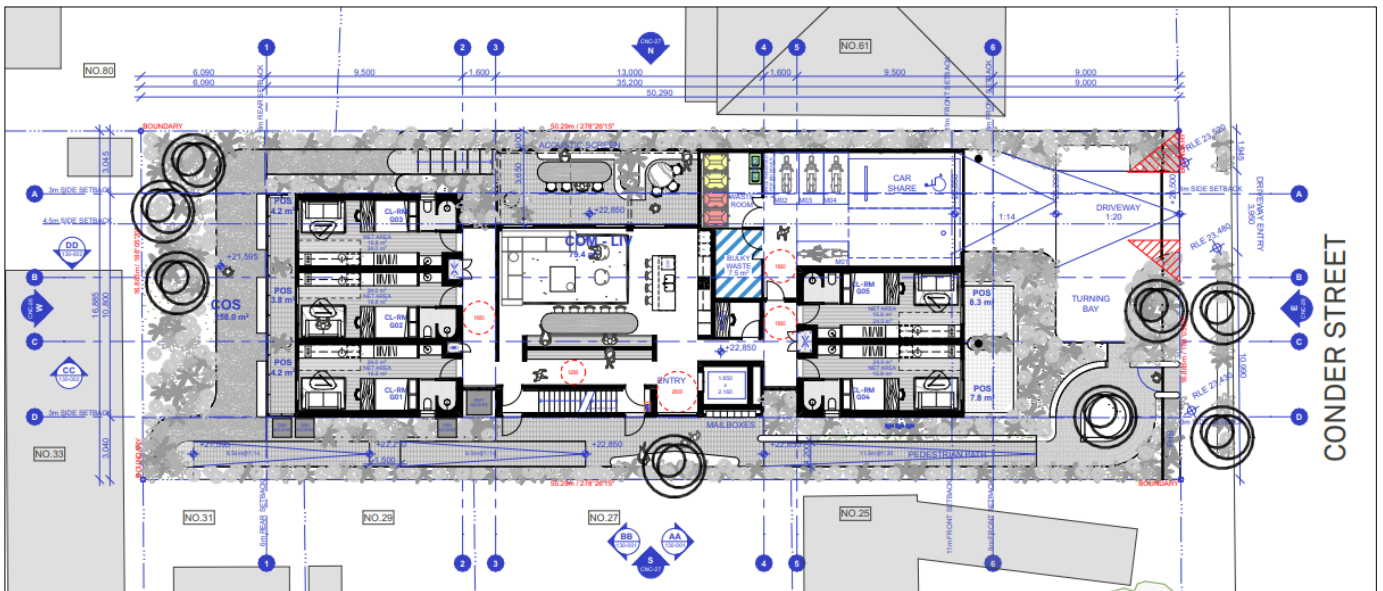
(above) Amended Ground Floor Plan submitted by the applicant. Source: Benson McCormack (2026).
